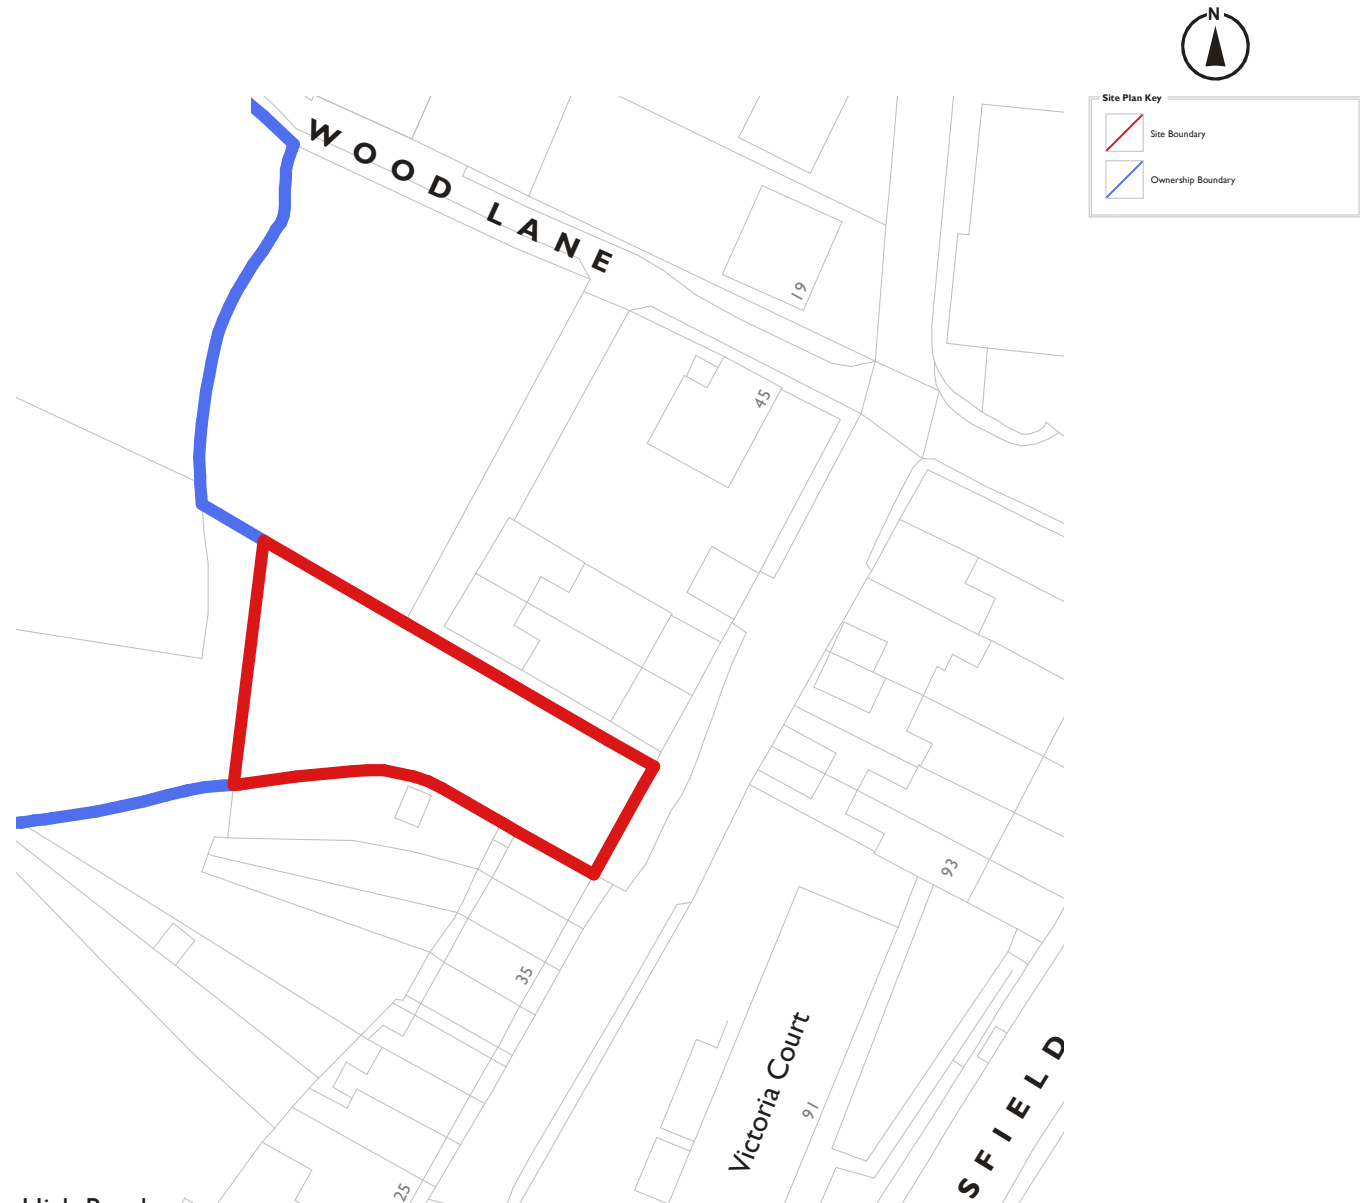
Location Plan (Millson Group). [DO NOT SCALE]
